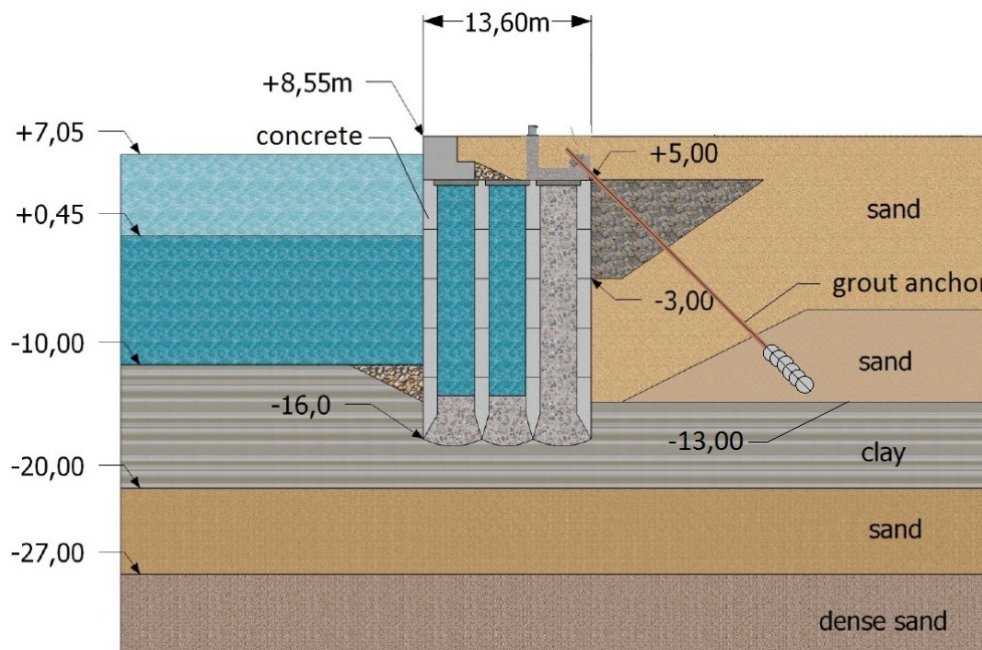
| Cross section GC-DB quay 6-7 (DHV BV, 2011c)
